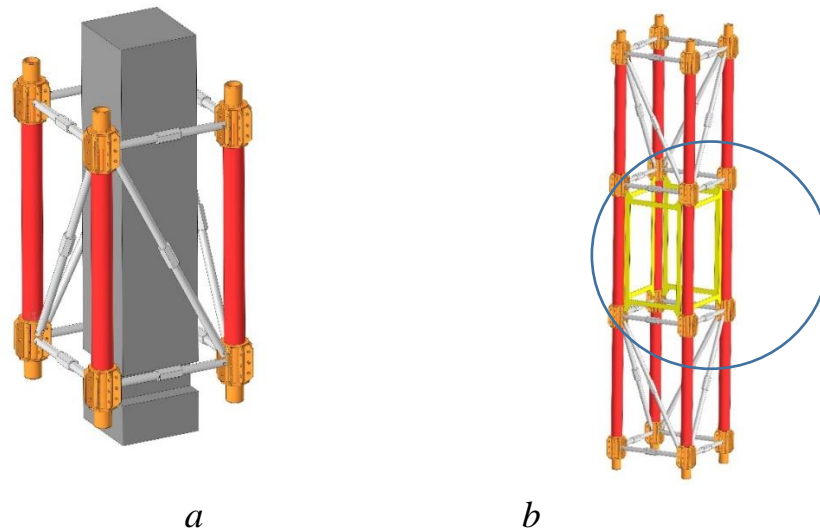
Diagram of the arrangement of the retaining column around the bridge abutment: a – section of the retaining column; b - arrangement of service areas of the bridge abutment
